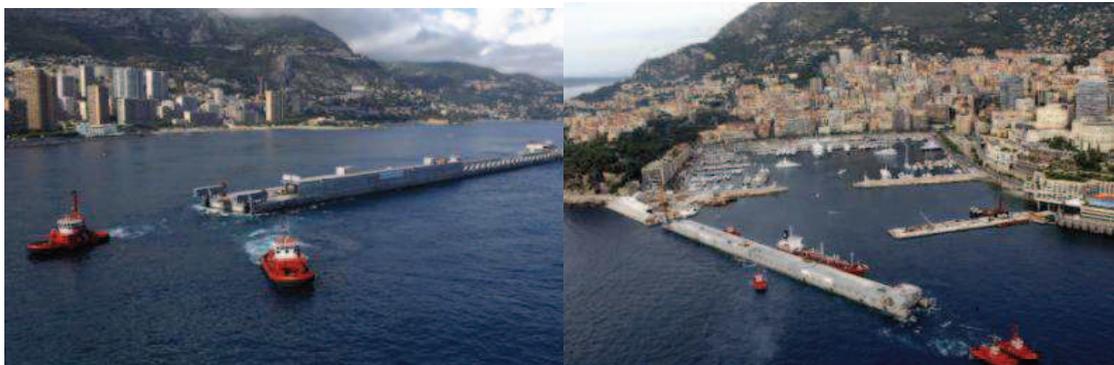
a) & b) “Floating concrete breakwater being installed in Port Condamine, Monaco” ^[33]
